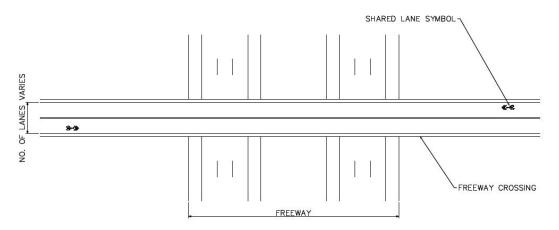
Plan View of Shared Lane Added to Existing Crossing
